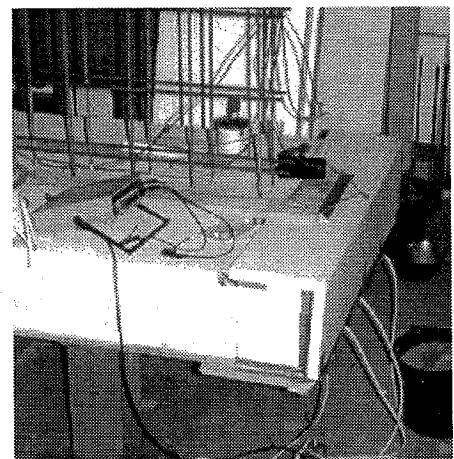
An insulated chamber is built around each end of the slab to prevent the air circulating in the cores from mixing with laboratory air.
